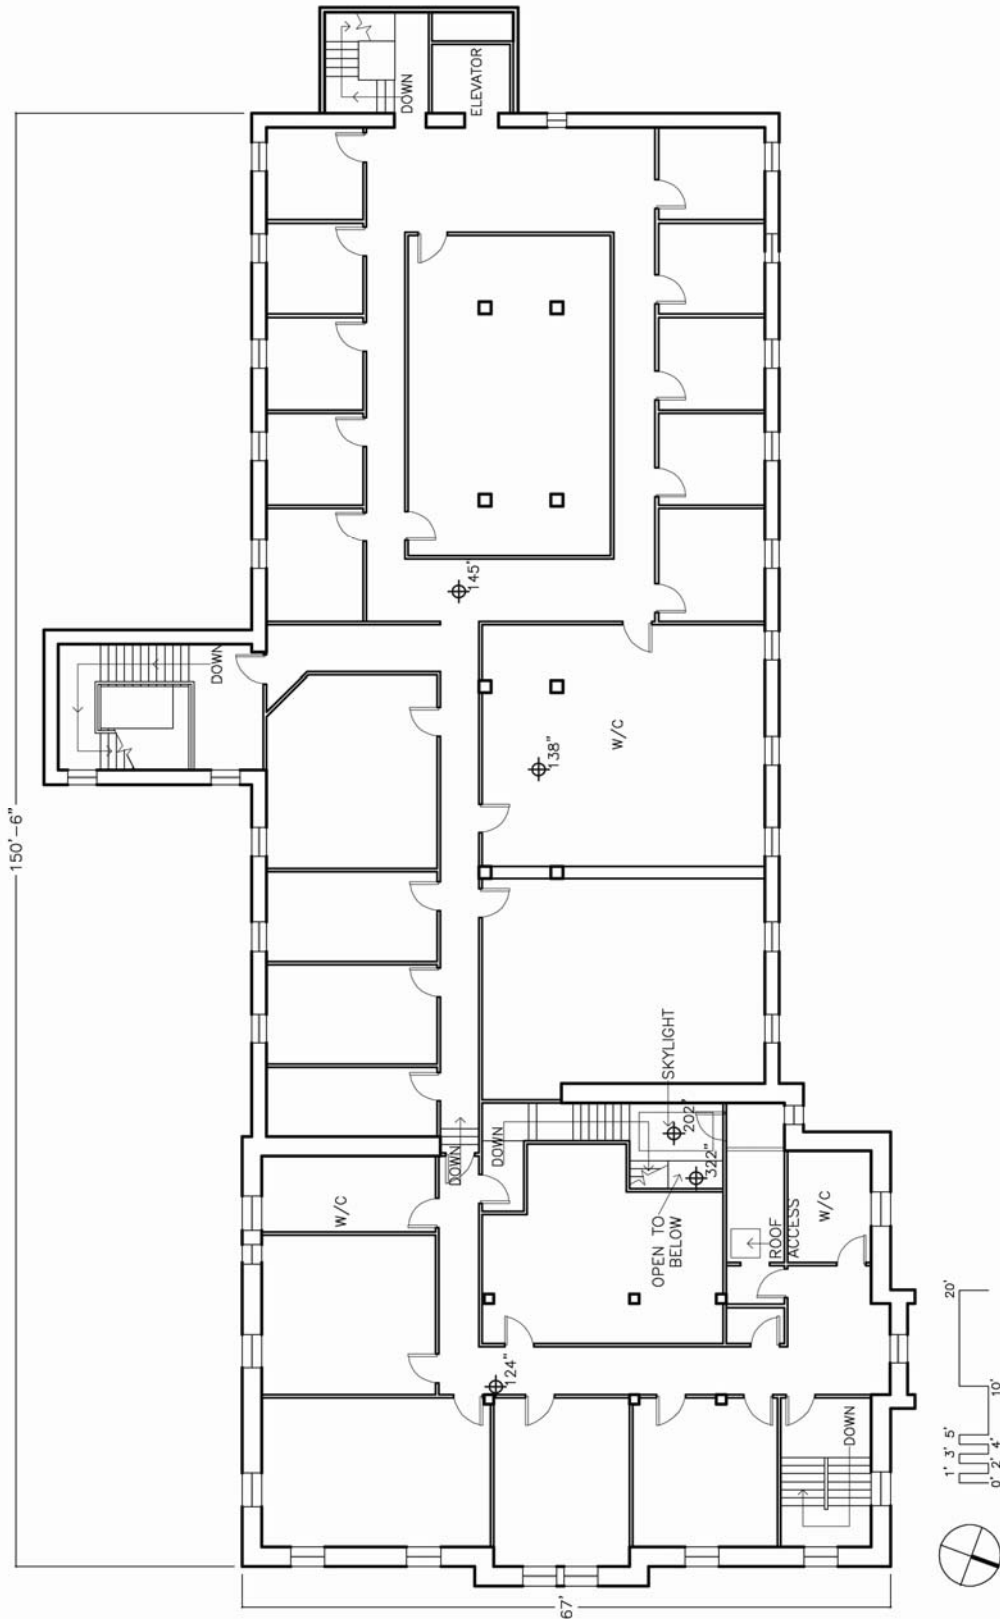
As built plan of the second floor of 210 rue Masson. Image by Natalie Foidart.
